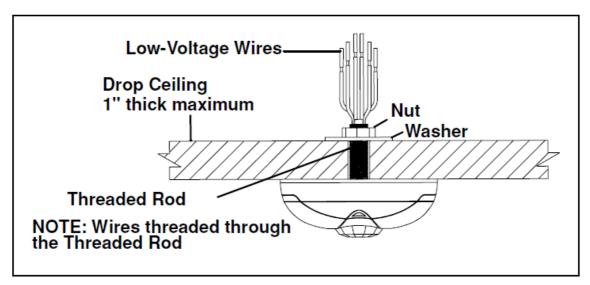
MC-C CEILING MOUNT INSTALLATION
